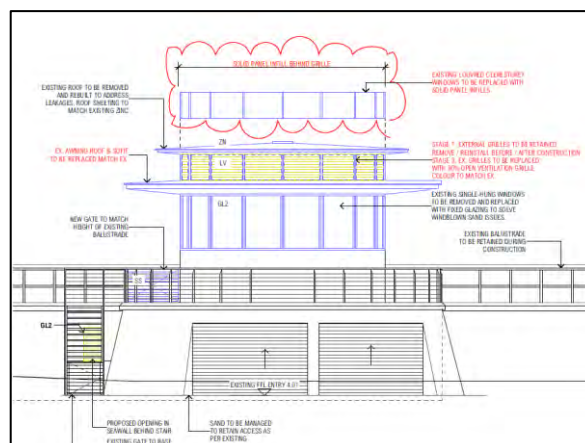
Proposed modifications to promenade level of Lifeguard Tower and Tunnel 2 (demonstrated in blue).
